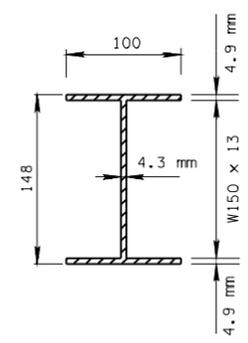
DETAILS FOR STEEL POSTS AND WOOD BLOCK-OUTS
